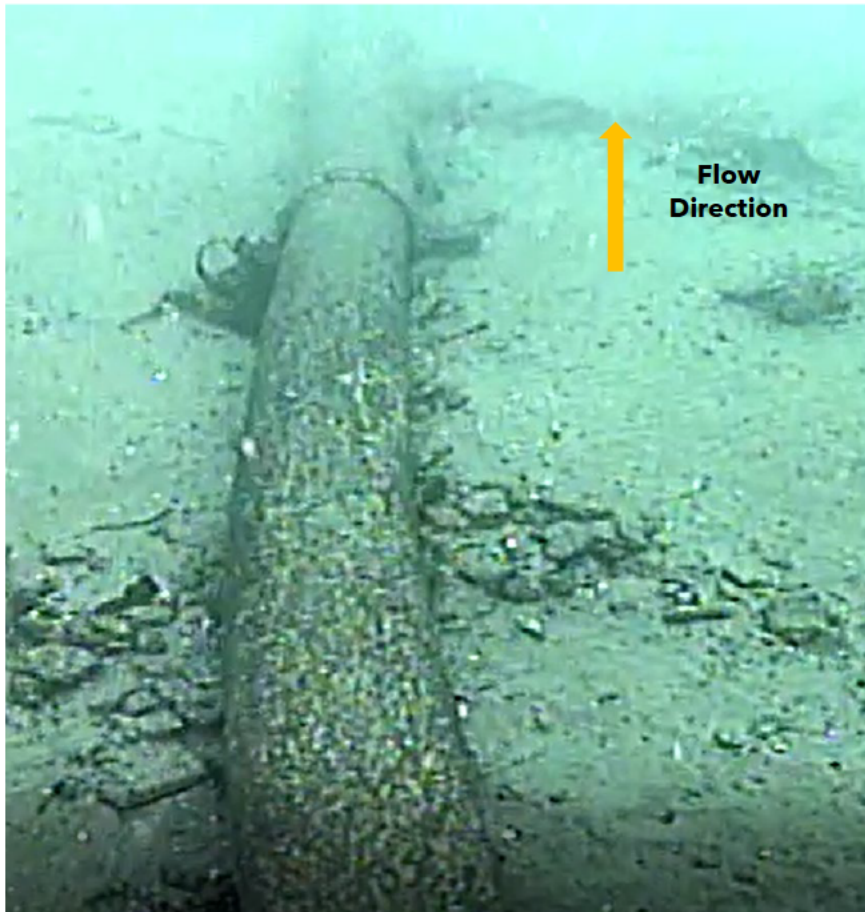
San Pedro Bay Pipeline with coating damage. Concrete coating can be seen sitting on the sea floor adjacent to the pipeline on both sides of the pipeline. Photograph by Beta Offshore.
